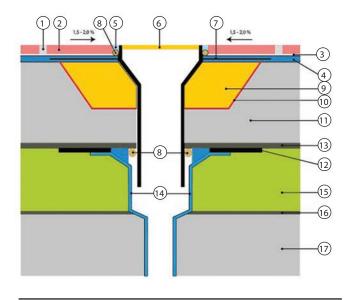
Mounting and sealing a point floor inlet in a terrace slab over a heated room – top layer of ceramic tiles.
